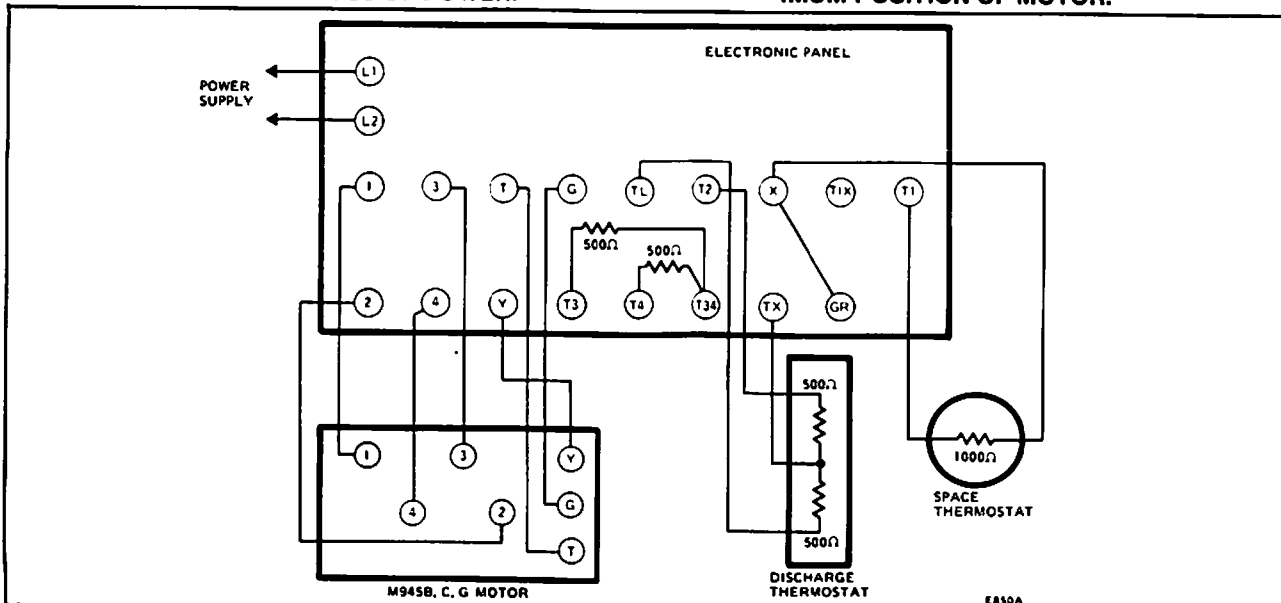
TYPICAL HOOKUP FOR MOTOR AND ELECTRONIC PANEL USED IN HEATING APPLICATION.
